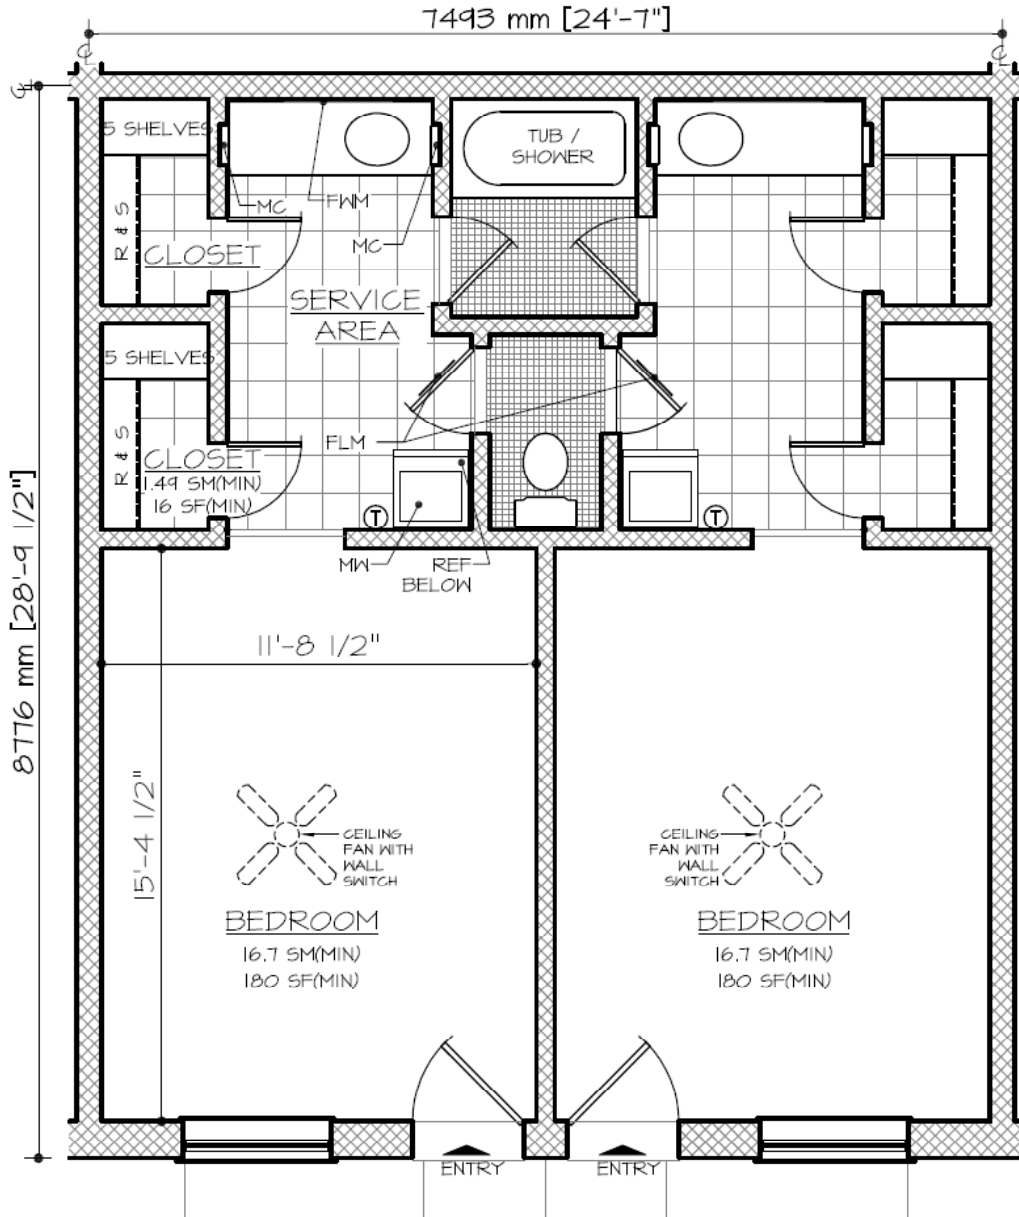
The Navy 2+2 Module (Exterior Access Plan)
